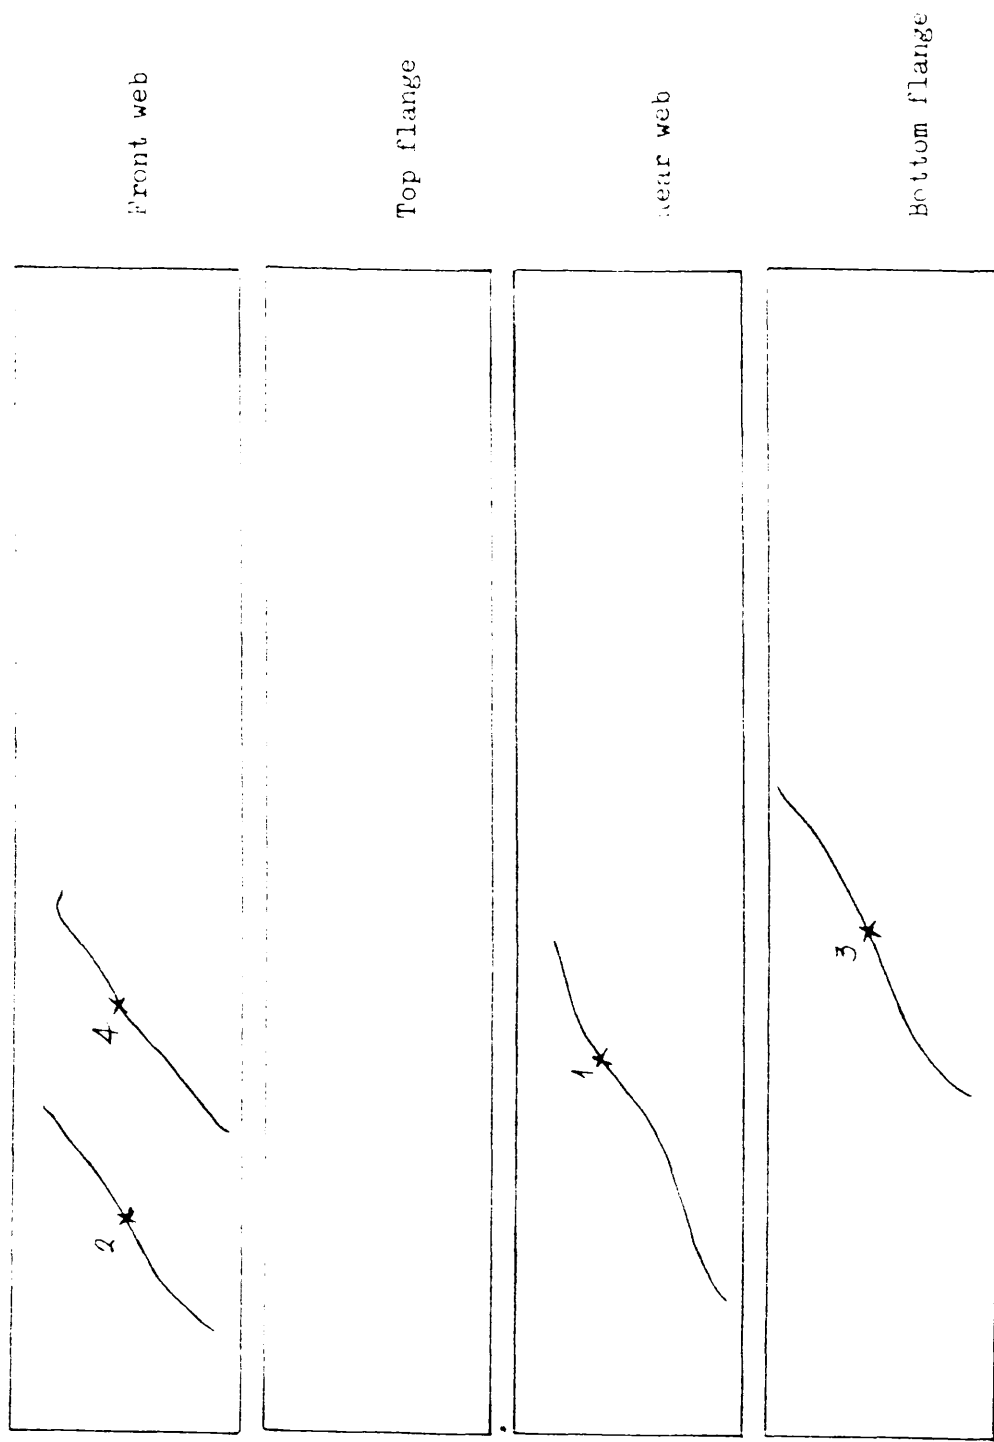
A Location of cracks where the measurements were taken for beam B2
